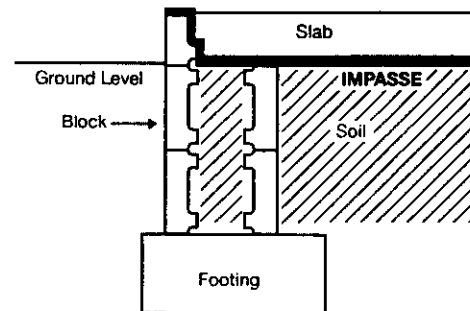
Shows Impasse Barrier installed over a hollow-block slab where the hollow-blocks will be filled with soil.
